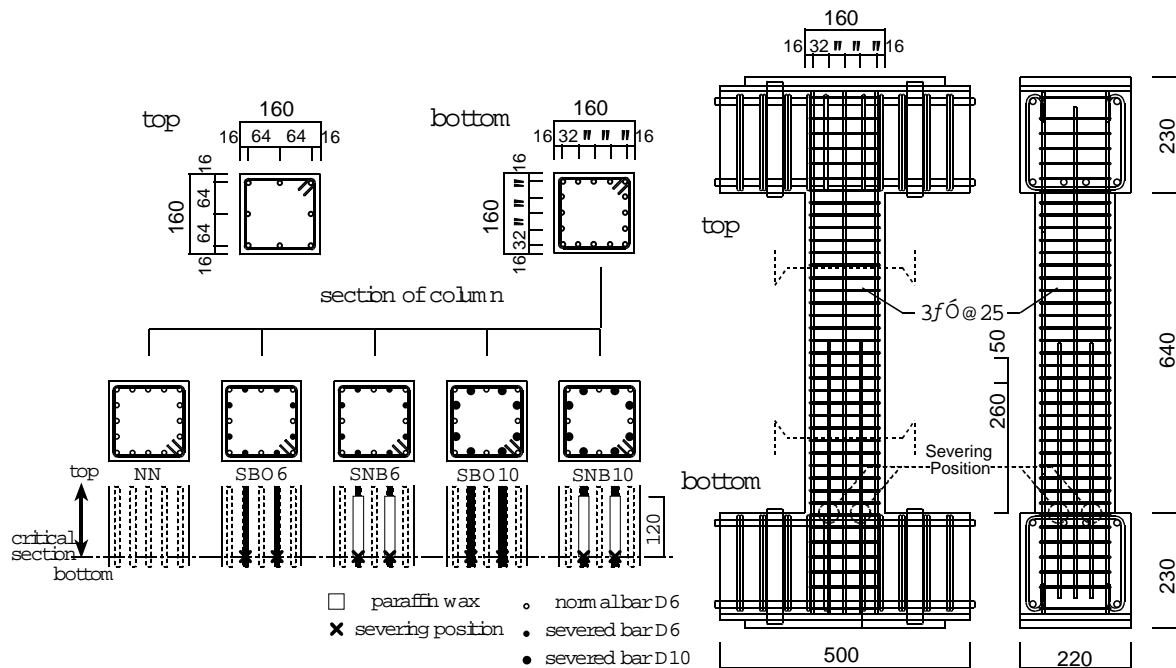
Dimension and detail of specimens for bending test with axial compression
